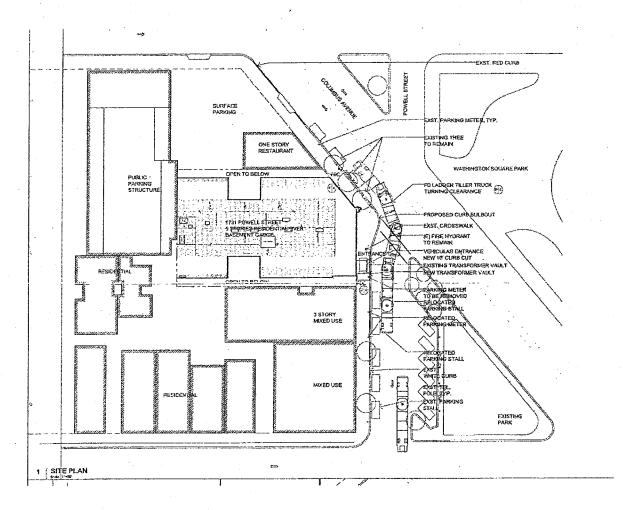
PROPOSED 1731 POWELL ST SITE PLAN Source: SWS 1/7/13
